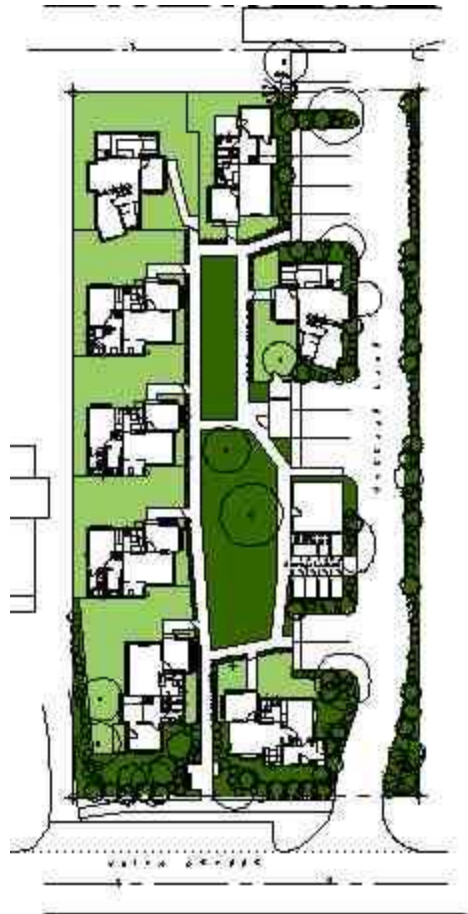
(M)(1). ~~Typical~~ Sample cottage housing layouts.
